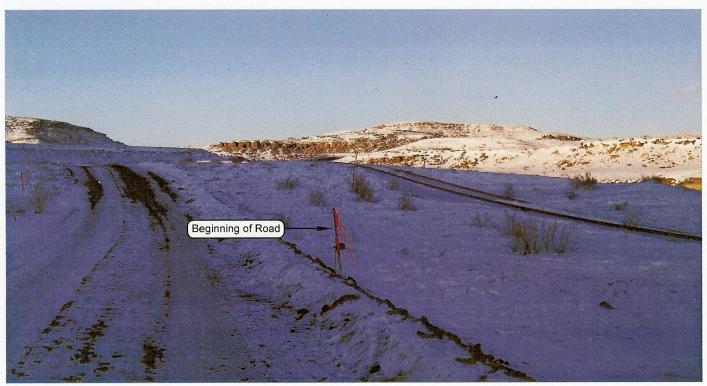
PHOTO VIEW: FROM BEGINNING OF PROPOSED ROAD
